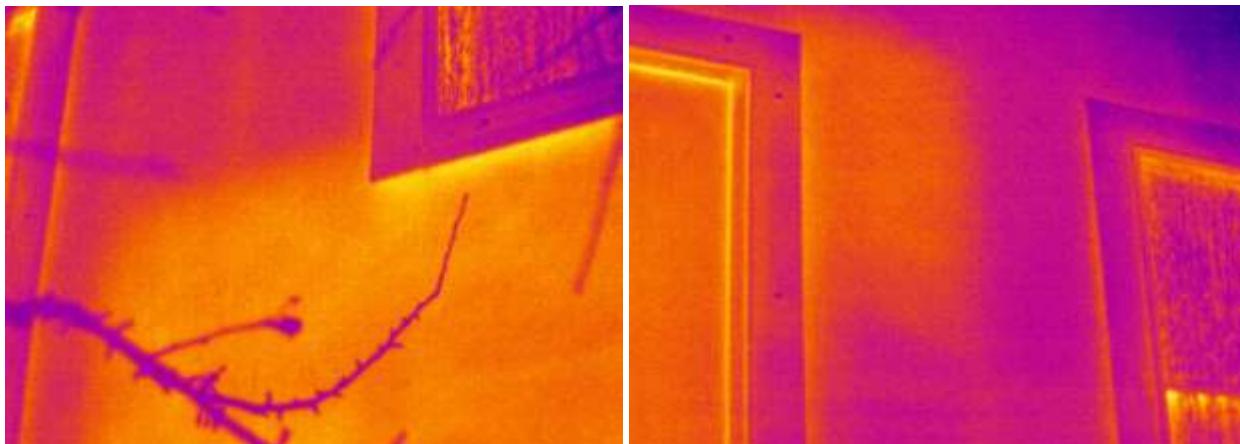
P4 missed insulation in bathroom due to tiled wall
